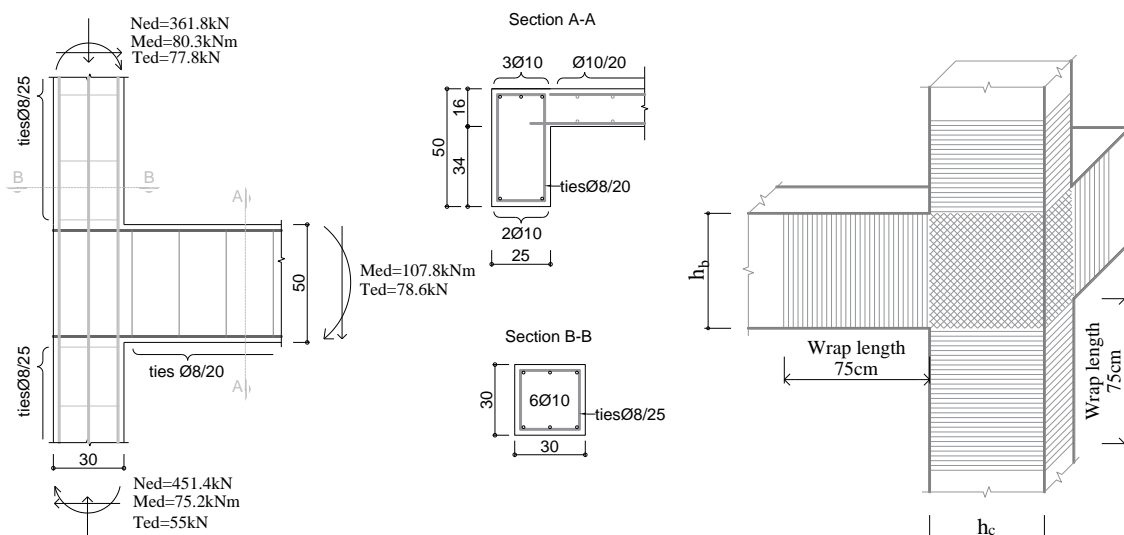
Reinforcement detailing of the joint and the layout of the strengthening scheme.
